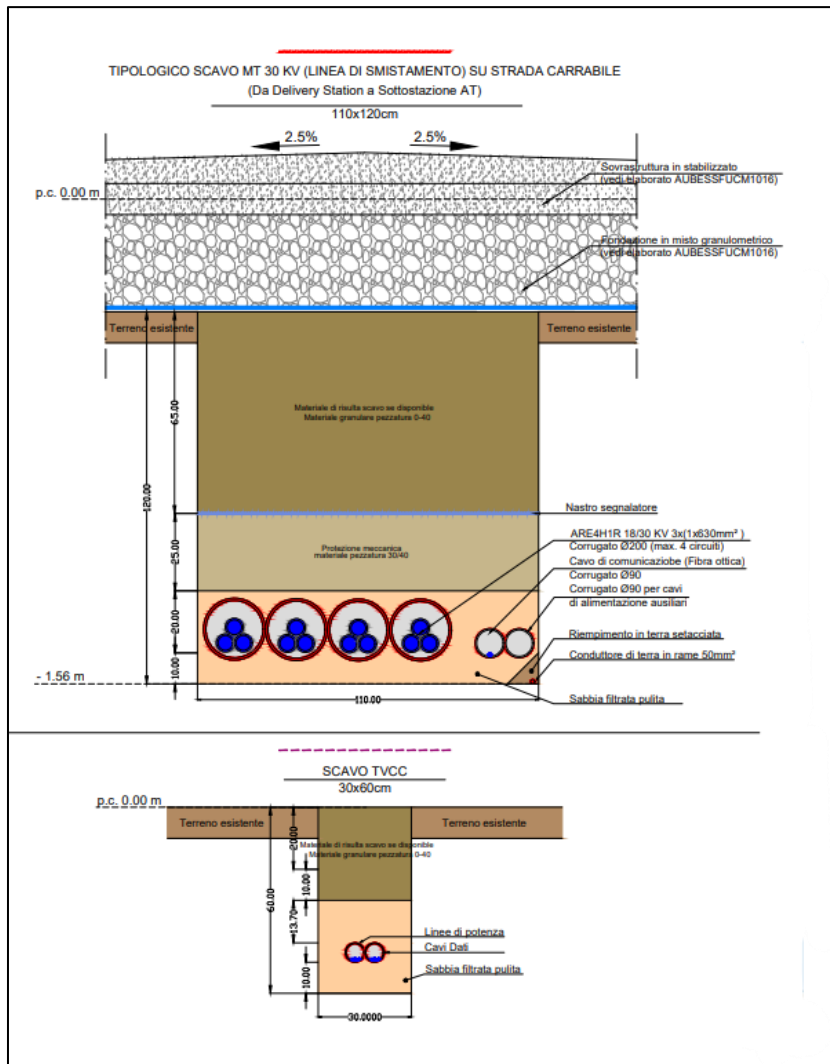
Extract of table "Layout plant: excavations planimetry"
